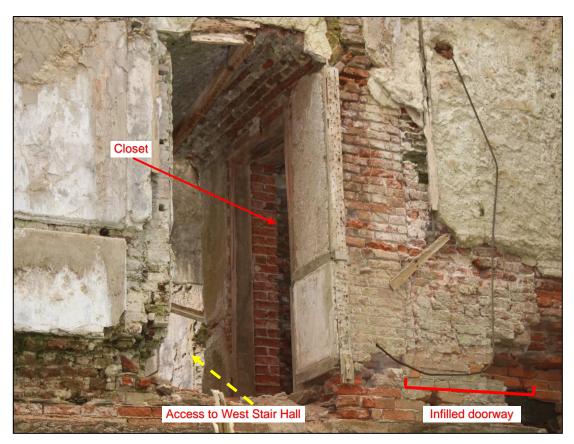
Doorway and tunnel connecting Cells E and F, first floor, looking south
